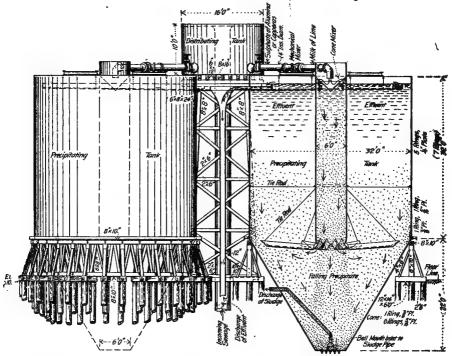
Elevation and Section of Dortmund Receiving and Precipitating Tanks at Chicago World's Fair.
